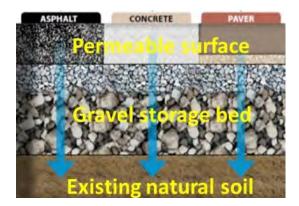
Exfiltrating permeable pavement cross section (underdrained configuration not shown). Adapted from ASCE/EWRI Permeable Pavement Task Committee Report (Eisenberg et al. 2015).
